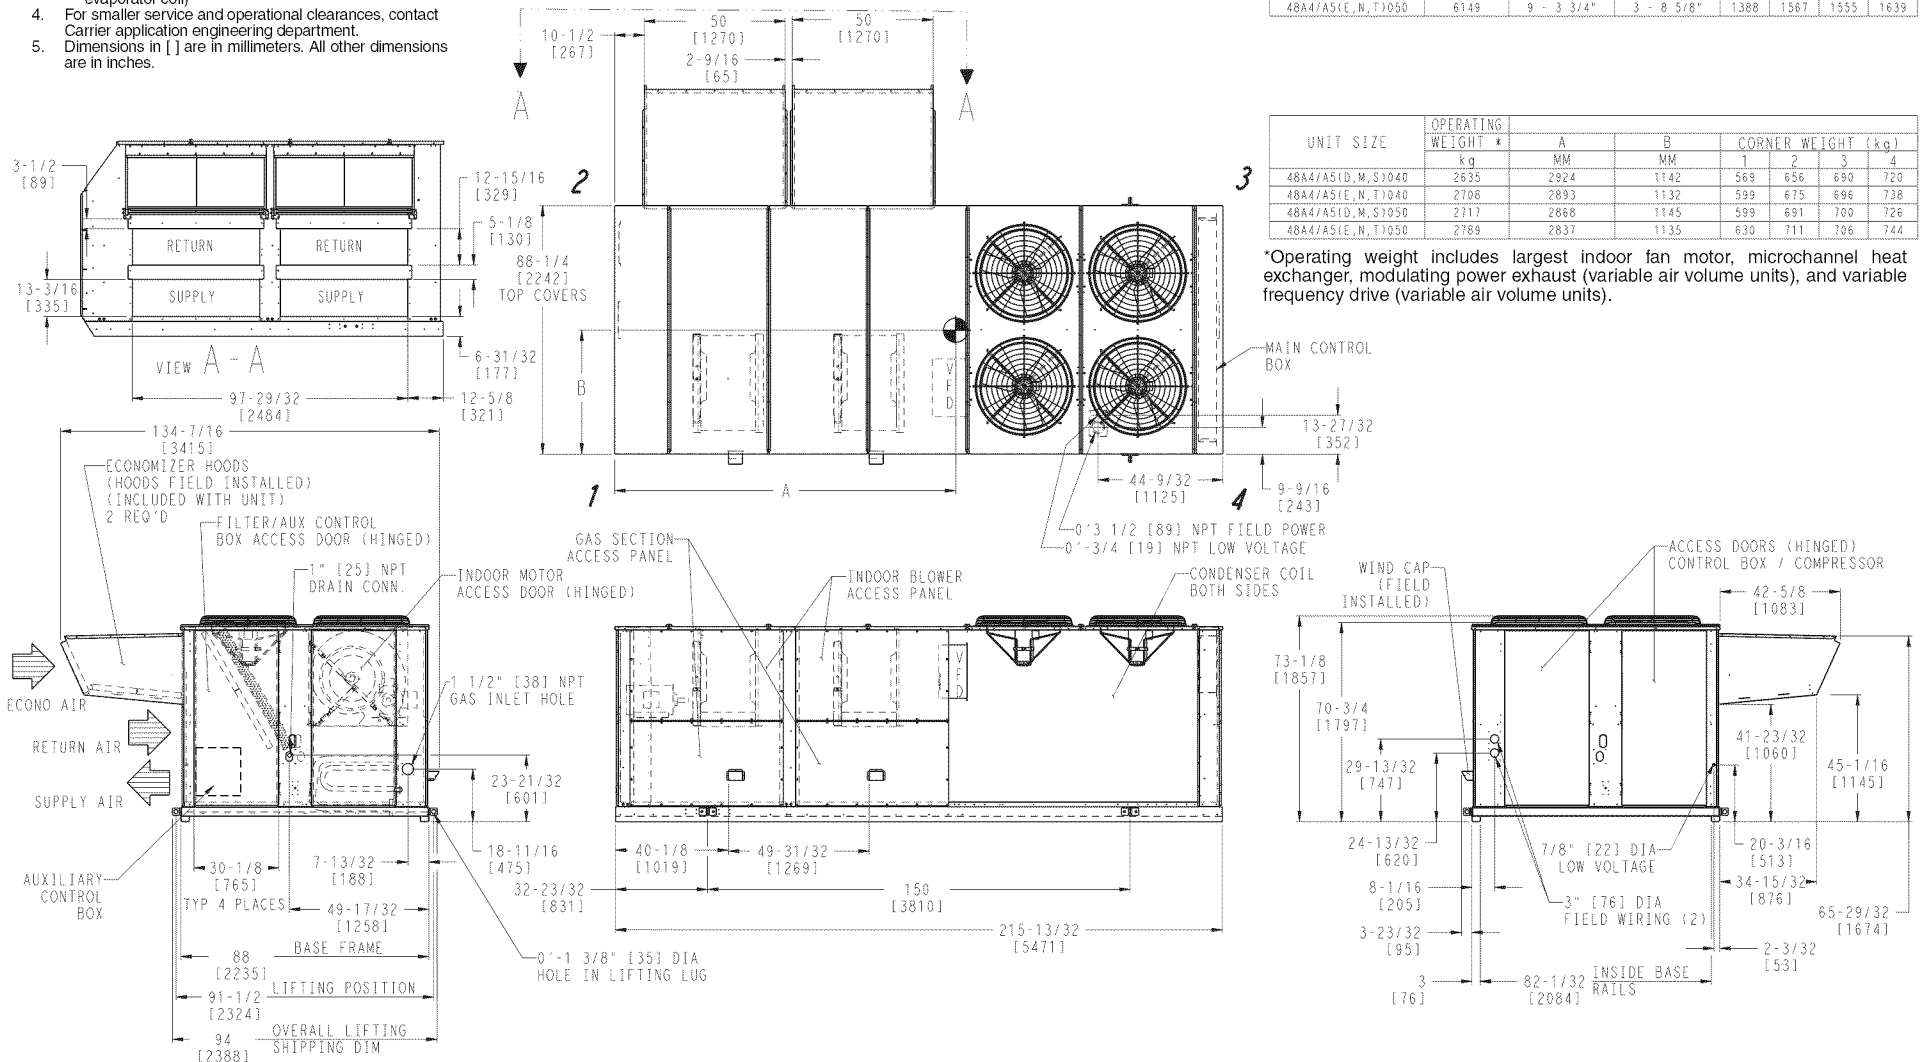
Base Unit Dimensions — 48A4, A5040-050
